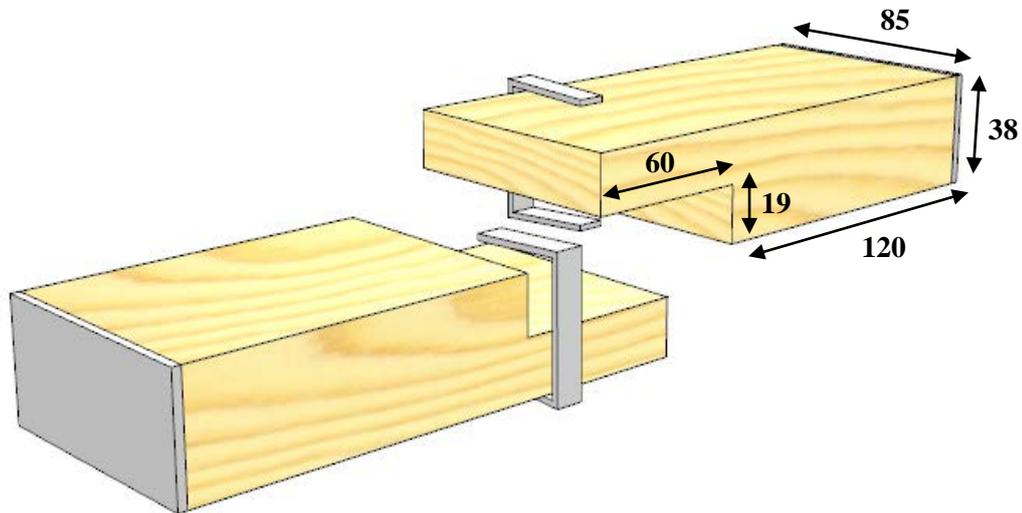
Exploded view of lap joint specimen, all dimensions in millimeter
